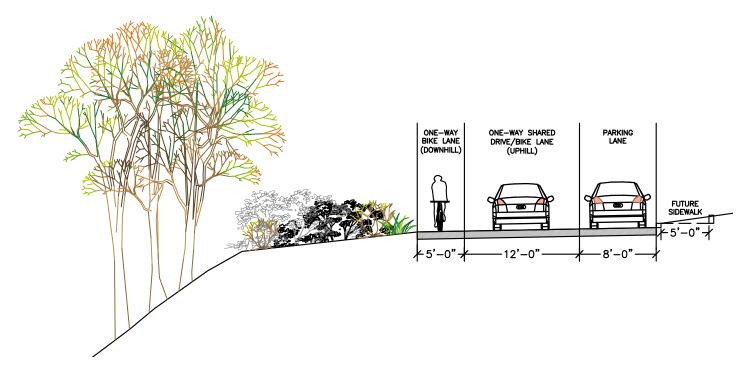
PROPOSED UPPER 15th AVE E SECTION
